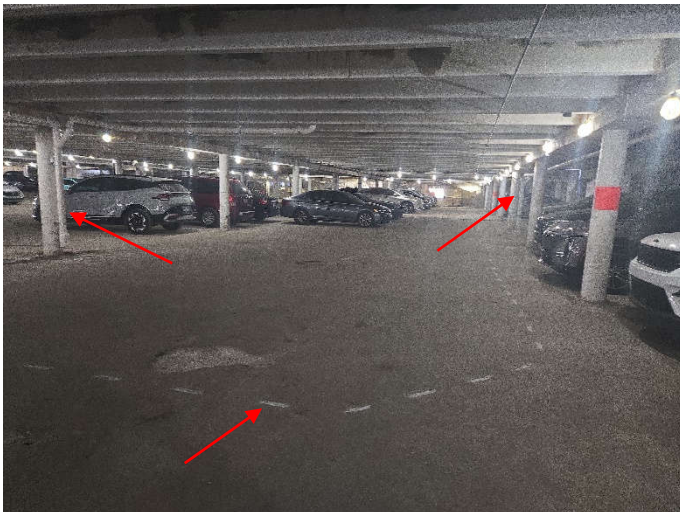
Plaza del Prado, Garage Deck Storm Drainage, Downspout ND1 and ND2. Proposed underground layout.
